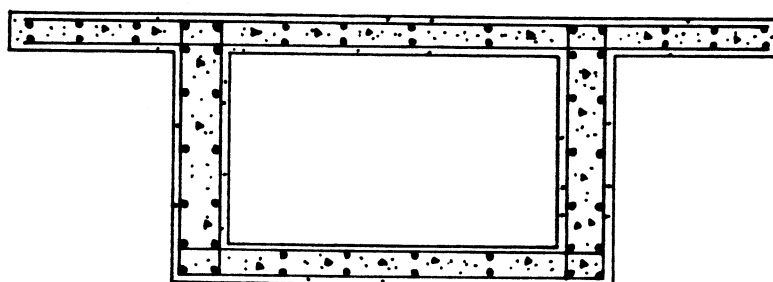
TYPICAL REINFORCED CONCRETE BOX BEAM CROSS SECTION
